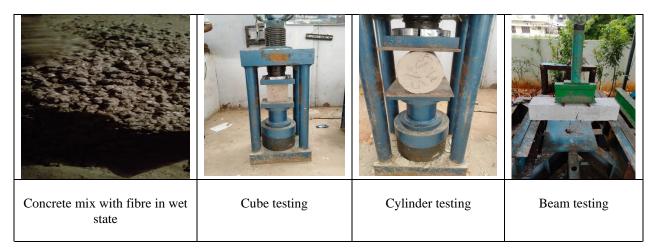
Wet mix of fiber reinforced concrete and testing of cube, cylinder and beam
